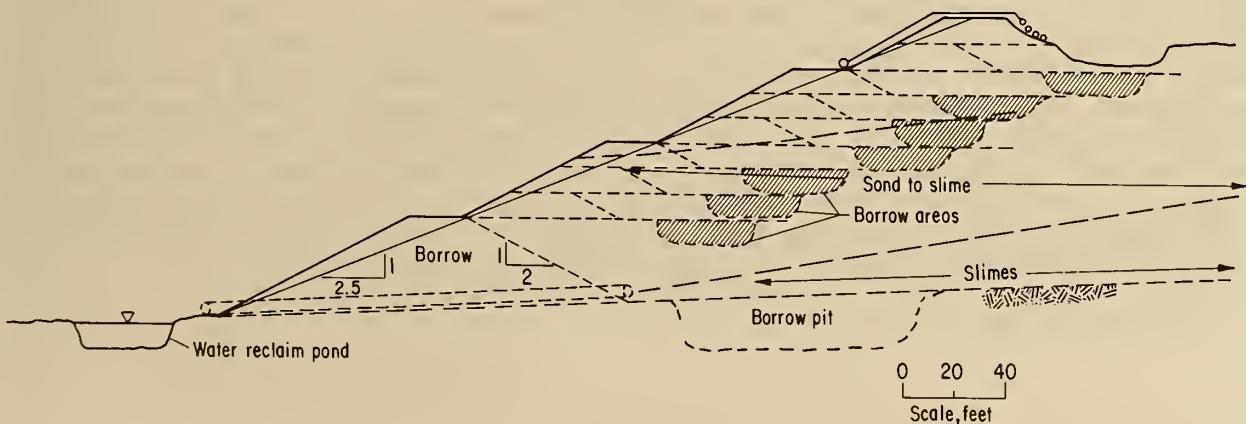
Barrier formed by borrow area in upstream construction.
